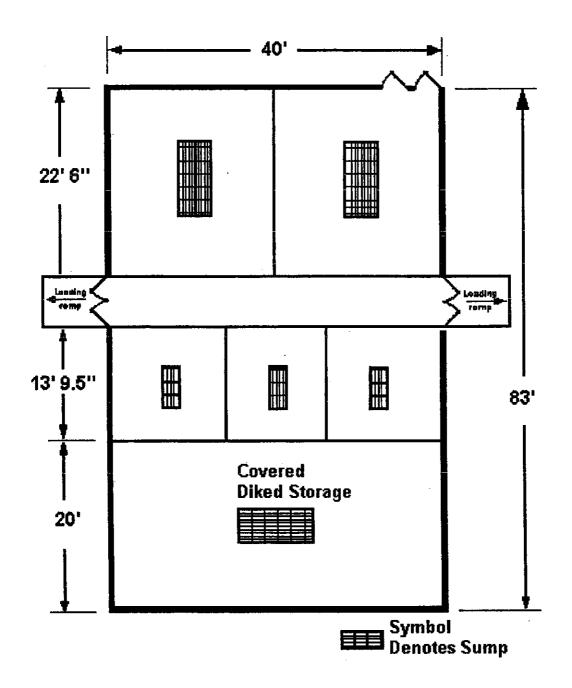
Hazardous Waste Storage Facility, Building 7652.
